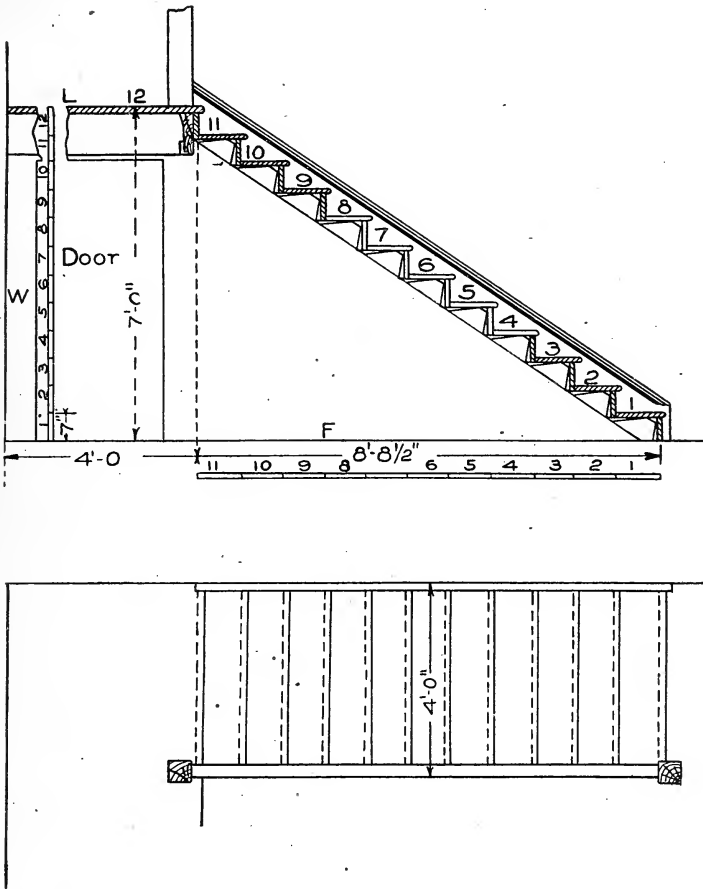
Method of Laying Out a Simple, Close-String Stair.
